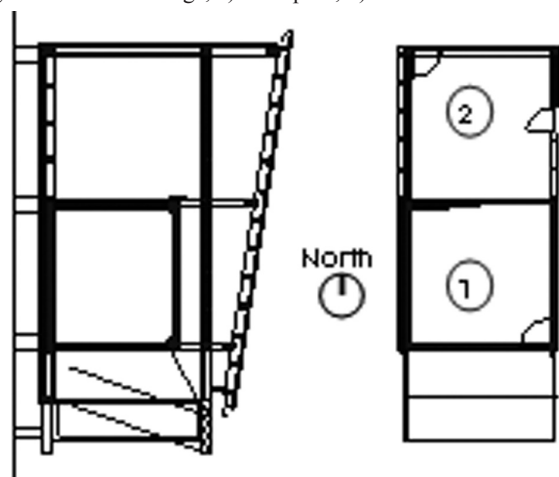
PTC drawings; a) floor plan; b) cross-section.
